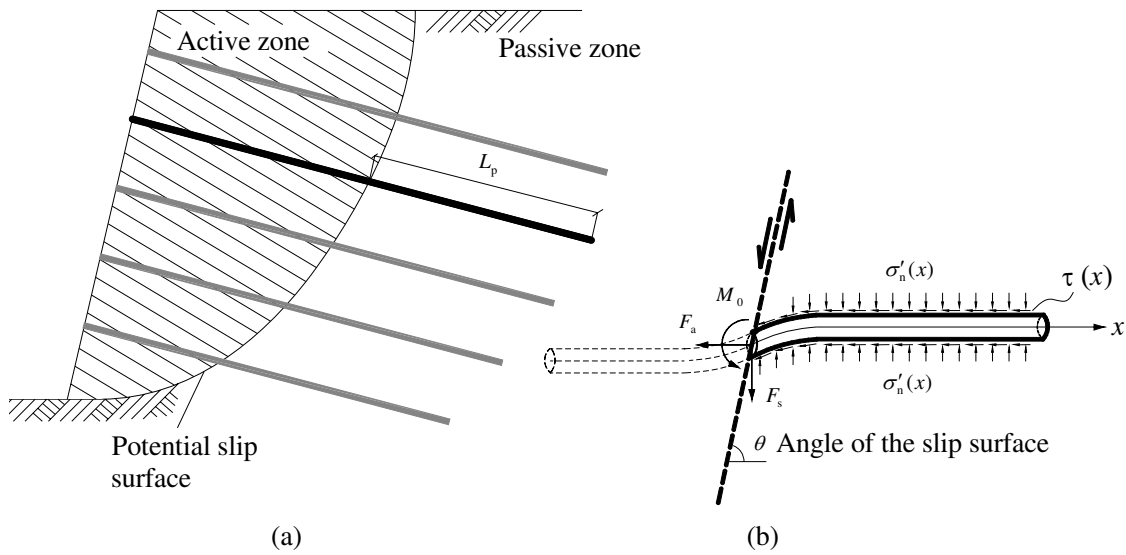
Failure principle of a soil-nailed slope (a) a slope reinforced with soil nails and (b) local mechanism of one soil nail in a slope
